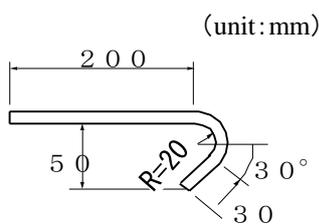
Shape of steel for fixing external form in case of using welded steel fabric
